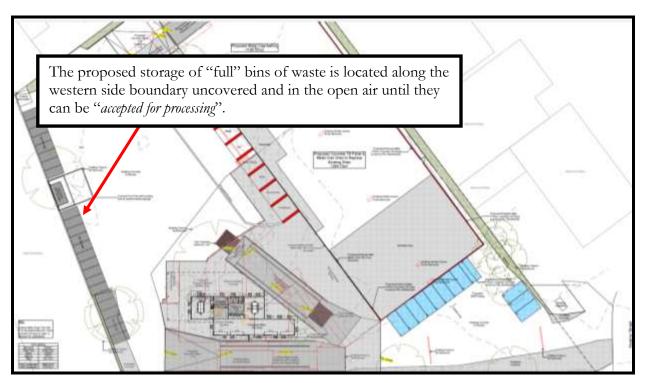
Proposed Site Layout (Source: Insight Architecture, 21 March 2016)
